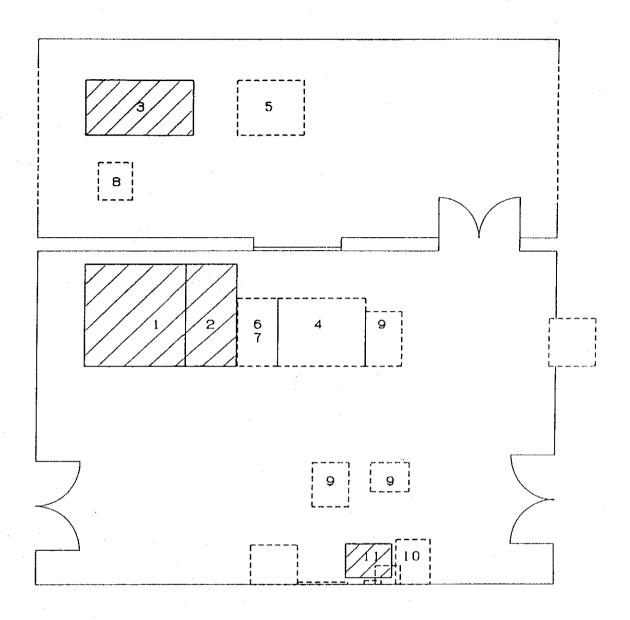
SITE LAYOUT OF MASINGINI TRANSMITTING STATION
